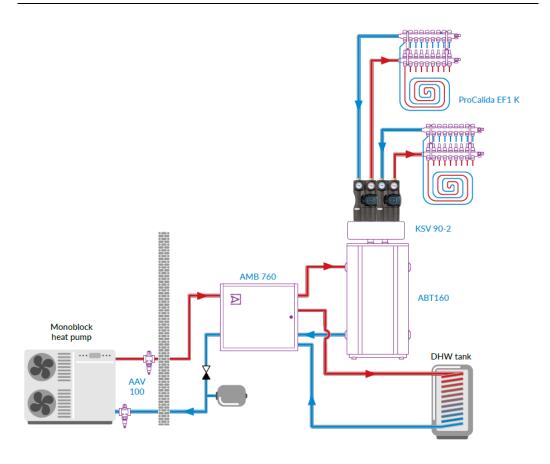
BPG assemblies mounted on a KSV 90-2 boiler manifold in a surface heating system with a heat pump
